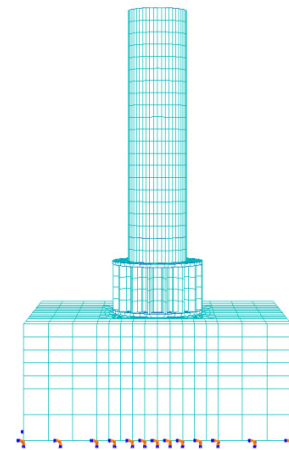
Boundary conditions applied in column-to-foundation connection model
